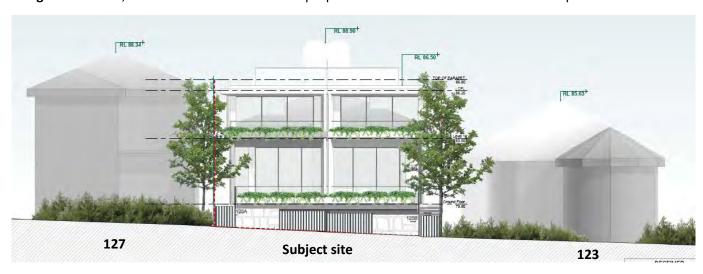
Proposed roof terrace and lift overrun within the streetscape.
